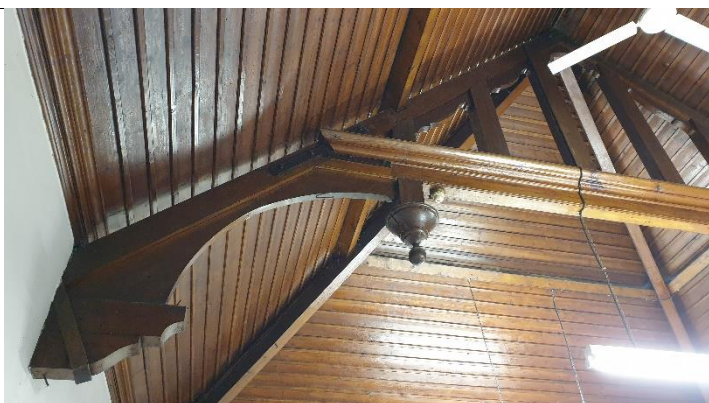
Exposed timber roof truss hipped at ends with exposed timber purlins and TG+V sheeting
